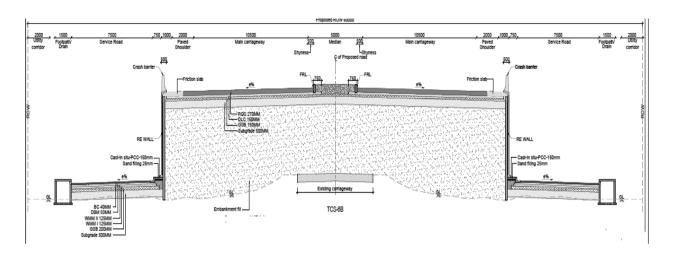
(TCS-6B) 4 Lane Underpass Cross Section With Service Roads In The Existing Road
